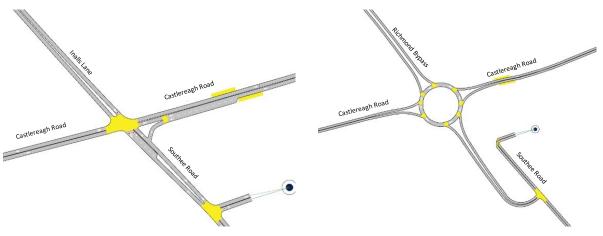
Richmond bypass and Castlereagh Road intersection (Location 5): existing layout (left) and proposed upgrade (right)
